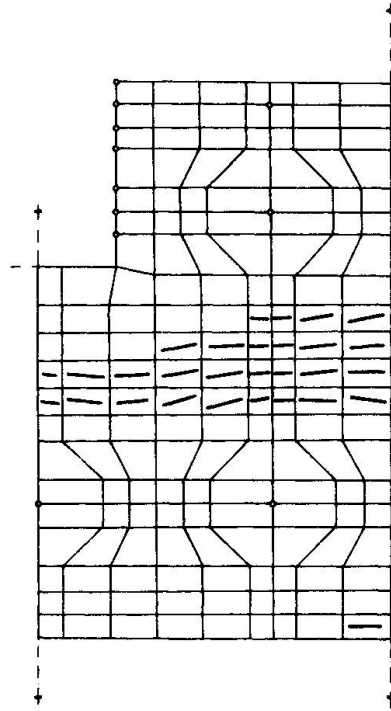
Garage slab. Finite element model with calculated crack pattern.
